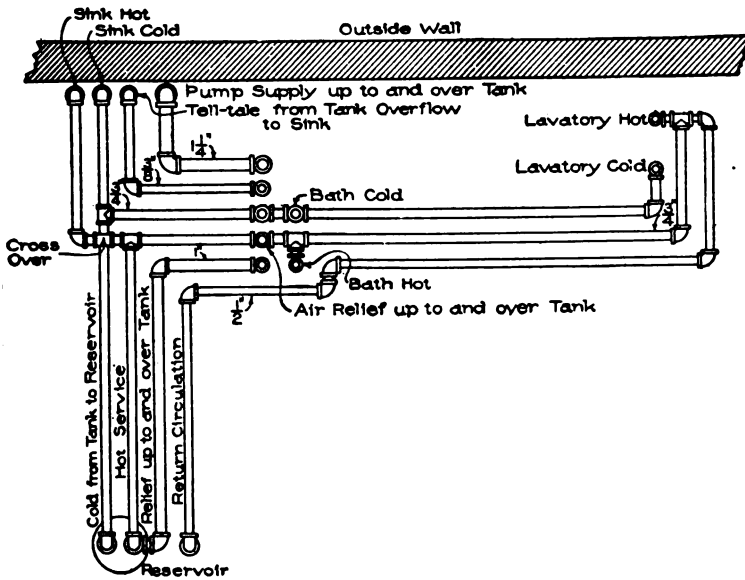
Plan Showing Layout, on Kitchen Ceiling, of Supply Pipes in Installation Shown in Fig. 75.
